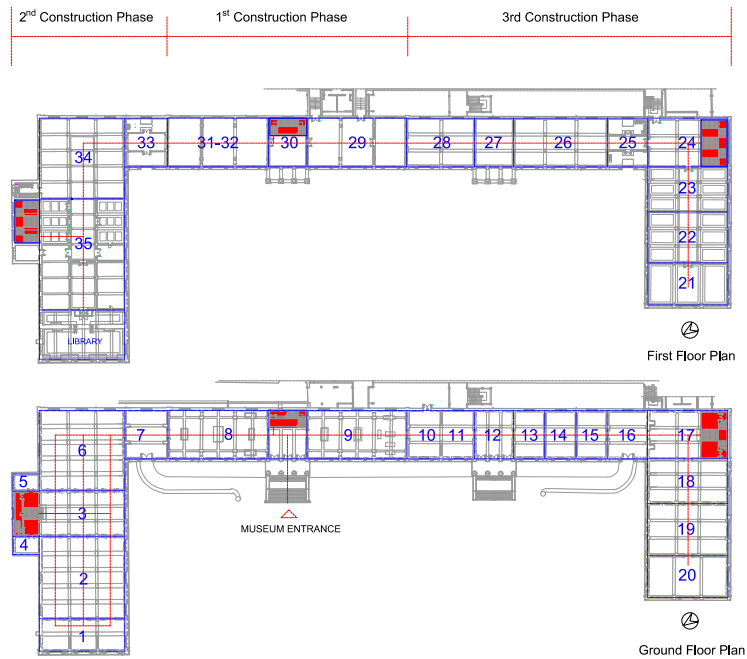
The circulation plan of IAM building for ground and first floor (drawn by the author on the restoration Project drawn by *Seçkin Mimari Hizmetleri*, IDSM Archive)
